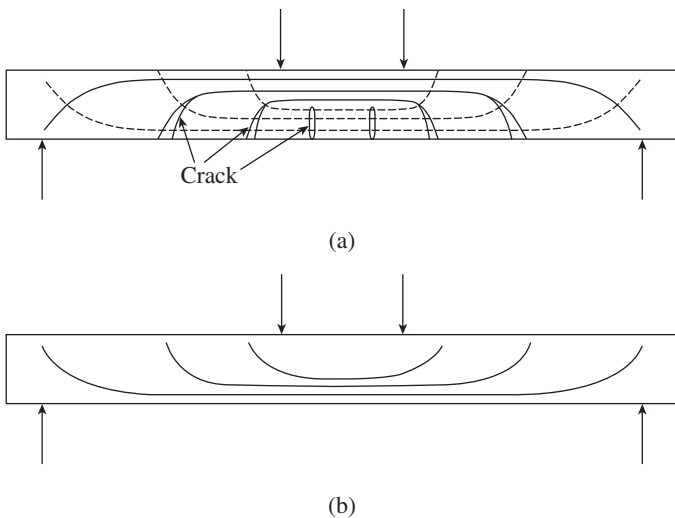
Cracking of beams due to tensile stresses (a) Typical cracking (b) Theoretical reinforcement required to resist such cracking
